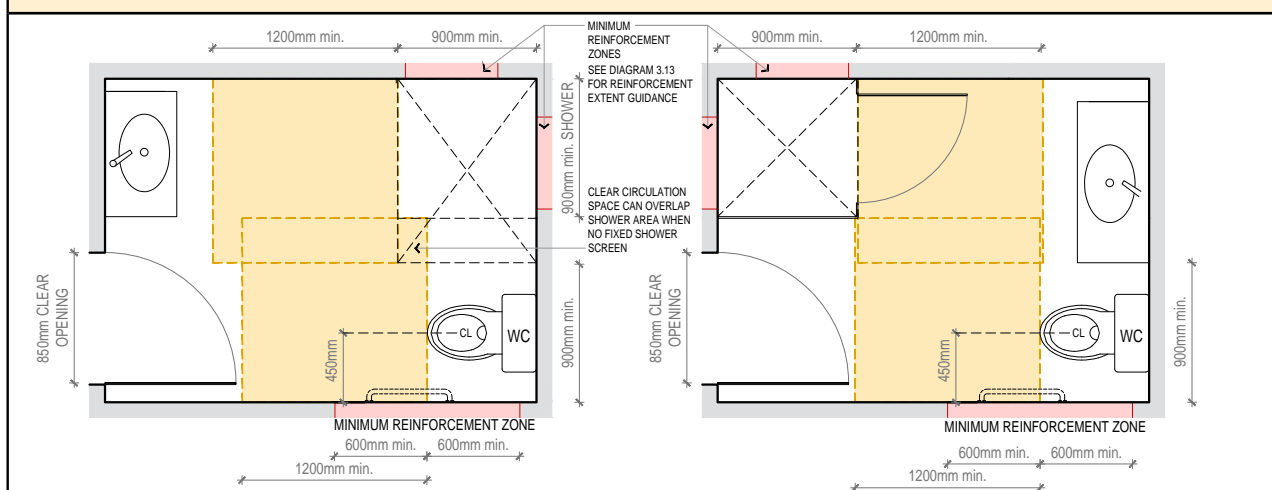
Toilet wall reinforcement elevation for future grab rails
